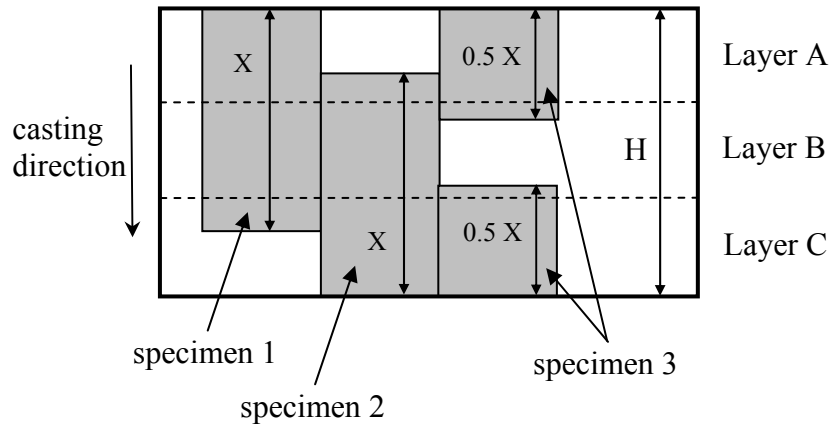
Drawing. Extraction of specimens shorter than the unit height (view into back face).
